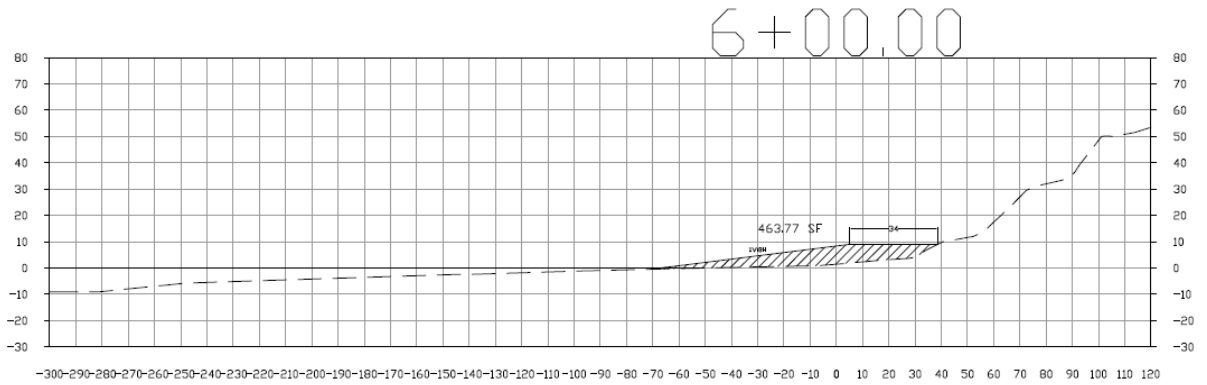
(c). Typical beach fill cross-section at Sta 6+00
